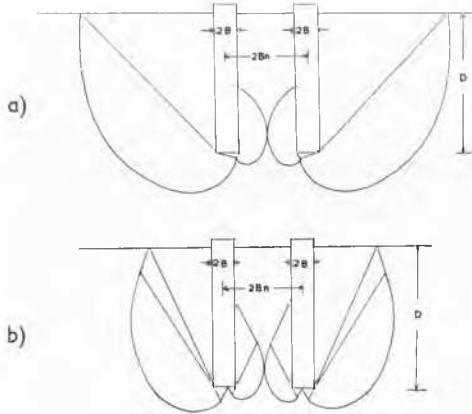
(a) Failure mechanism — rough foundation. Mécanisme de rupture — fondation rugueuse.
